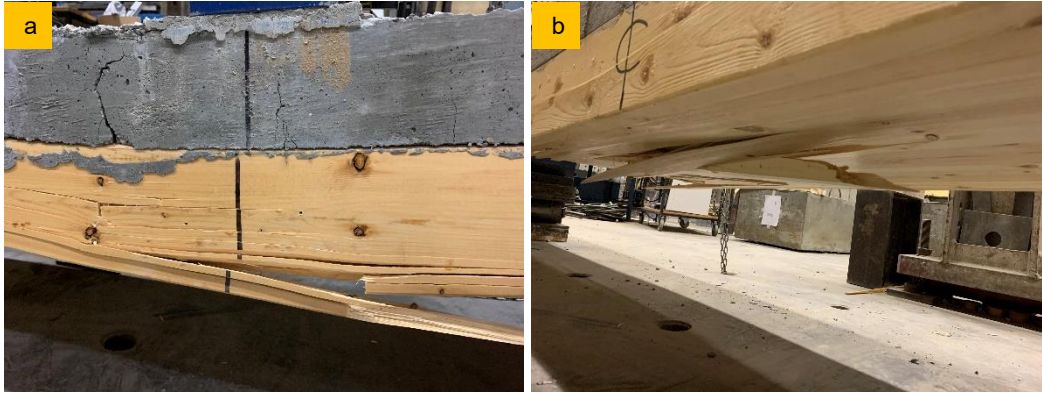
Timber fracture in specimen (#7) GLT4.5-C100-I15-45°-S500; a) side view with concrete crack in tension zone and b) bottom view
